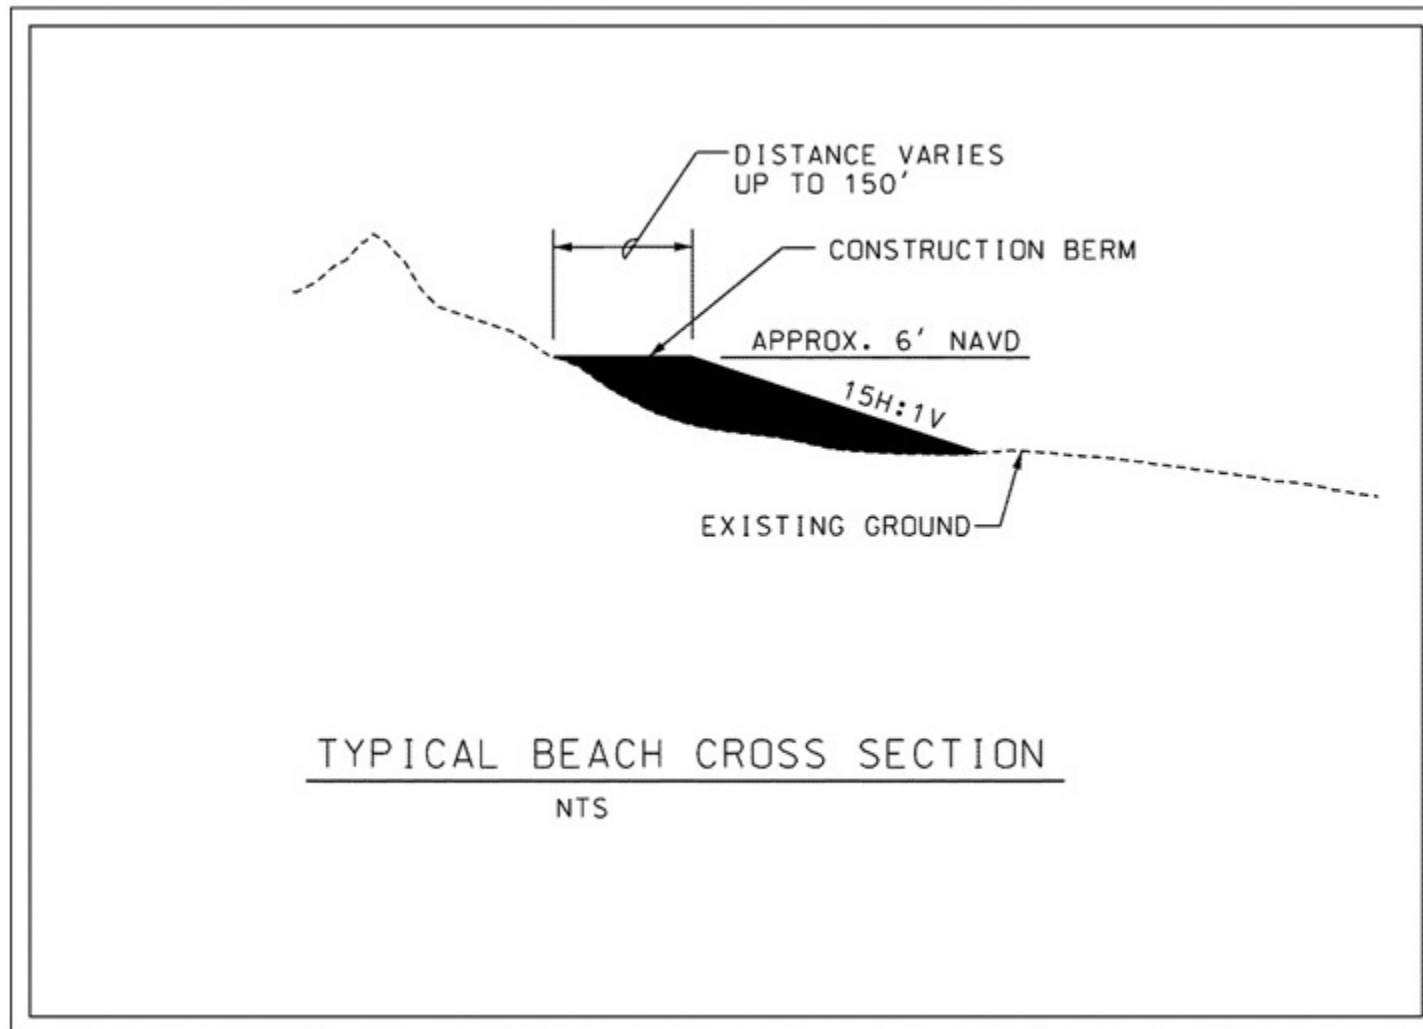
Typical Beach Cross Section from Dune Base to about -24 foot depth (Not to Scale).
